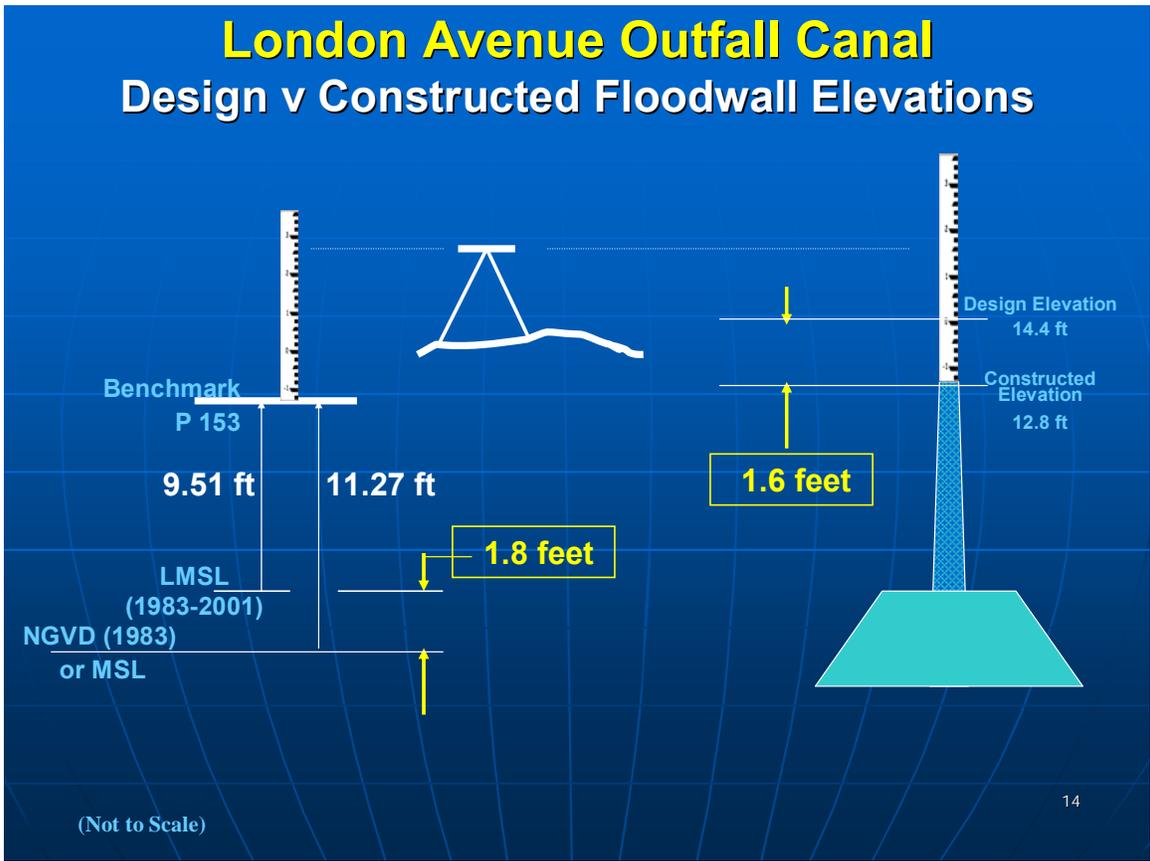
Impact of using NGVD elevation instead of LMSL elevation for construction stakeout of London Ave. Outfall Canal floodwall construction.
